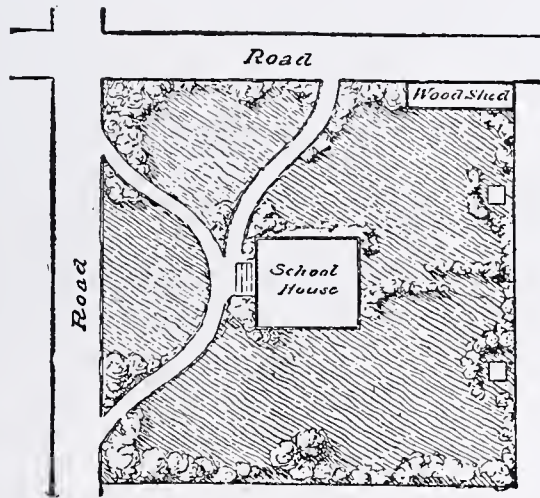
Suggestions for the planting of school yard upon four corners. From "Lessons with Plants"
